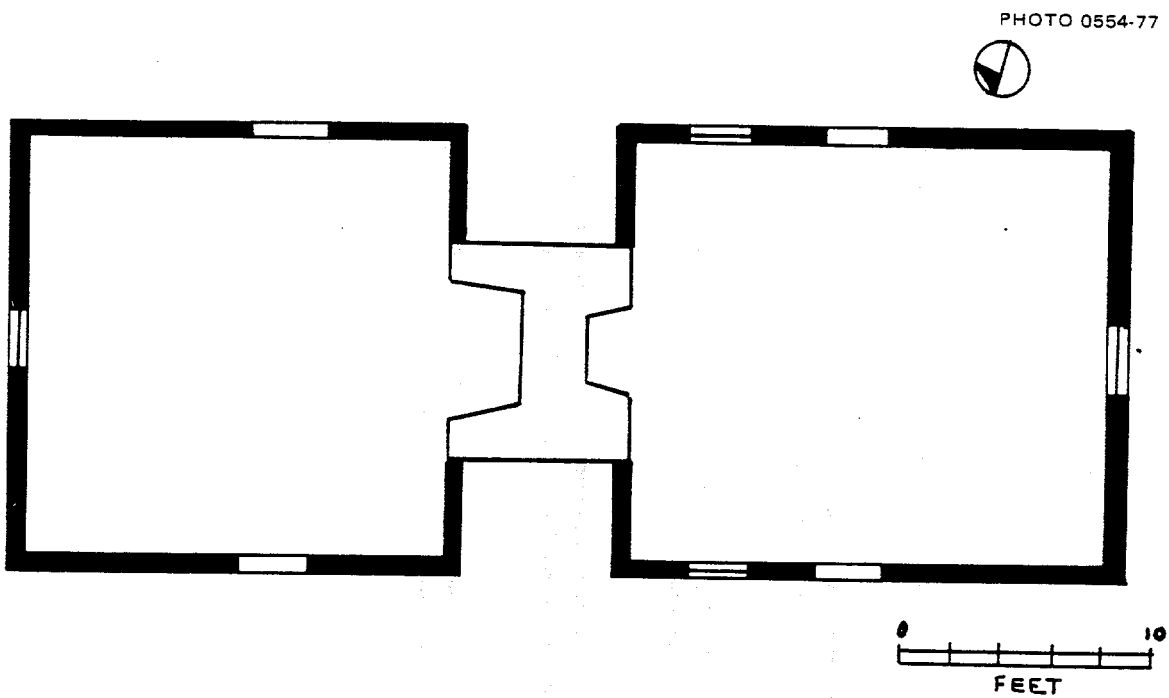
Ground Floor Plan, Freels Cabin (Structure 640A).
